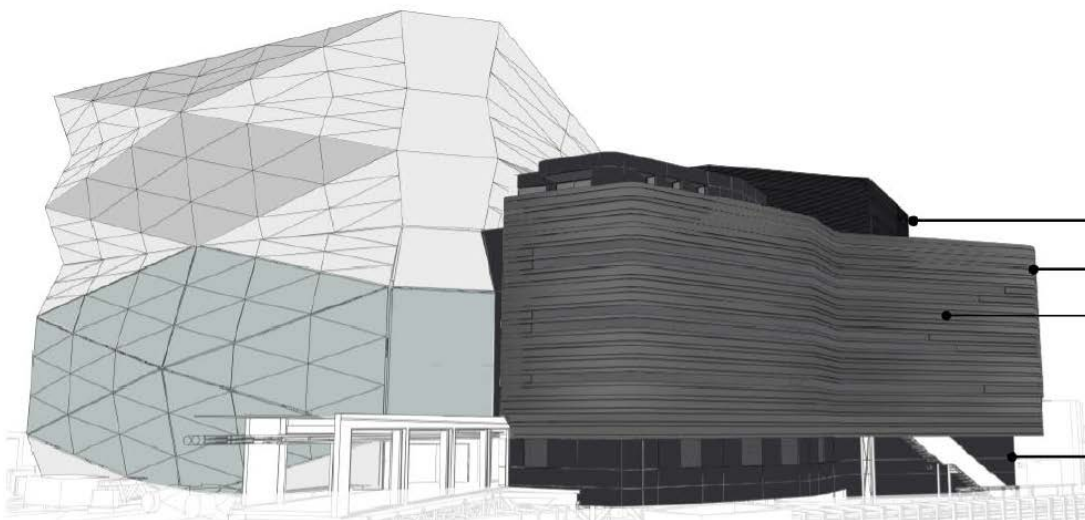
| Originally proposed fly tower and dressing room materiality clad in dark grey aluminium (Source: Applicant’s design statement)
